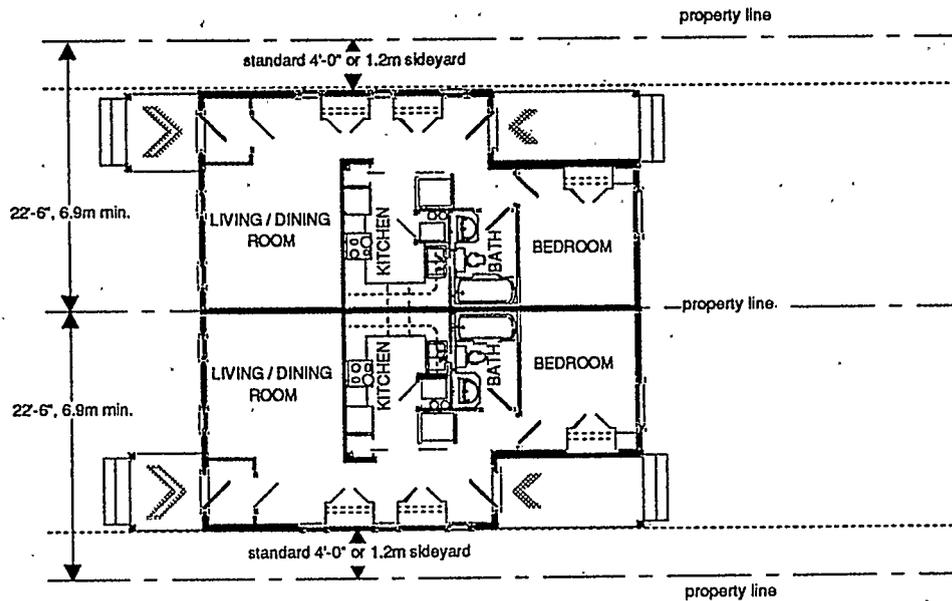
Plan of narrow width duplex. Each unit requires a minimum lot width of 22 1/2 feet (6.9 meters)
